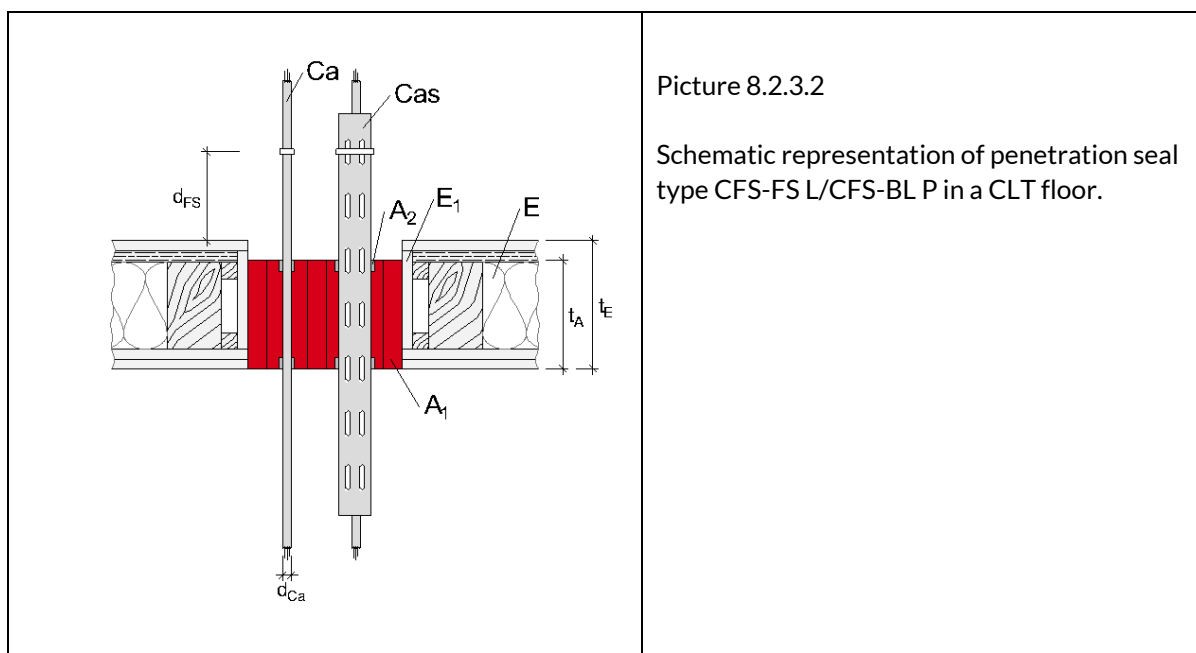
cable penetration applications through CFS-FS L or CFS-BL P seal in a 8.2.3 Closed timber beam floor construction
